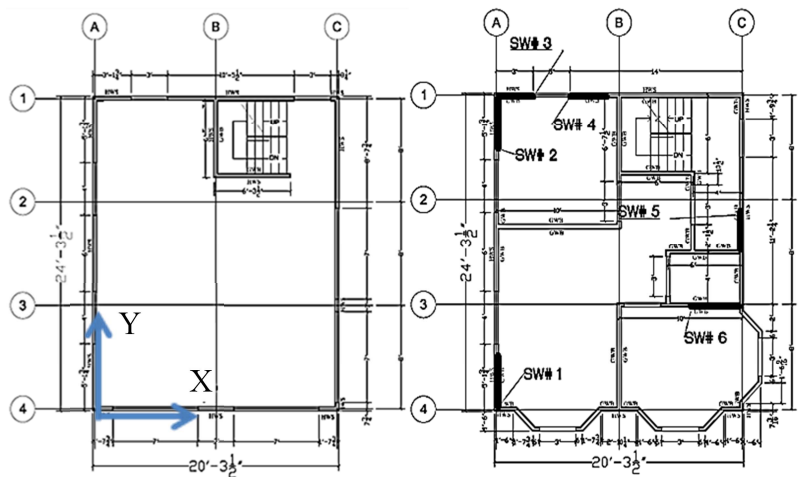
Test building floor plans; (a) story 1; (b) stories 2 and 3.
